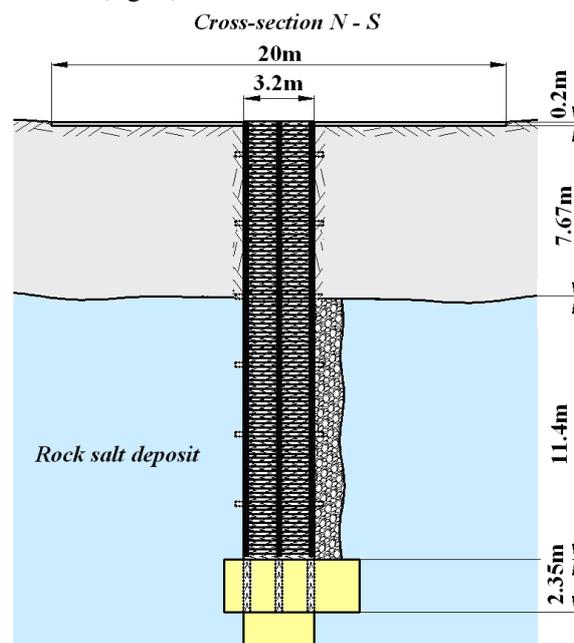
Rebuilding of the shaft timbering close support - variant V1
